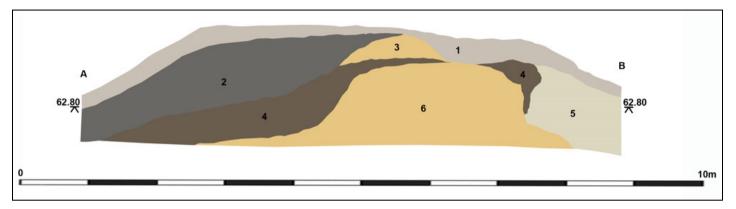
Drawn section of the north face of the pipe trench through the dam.
